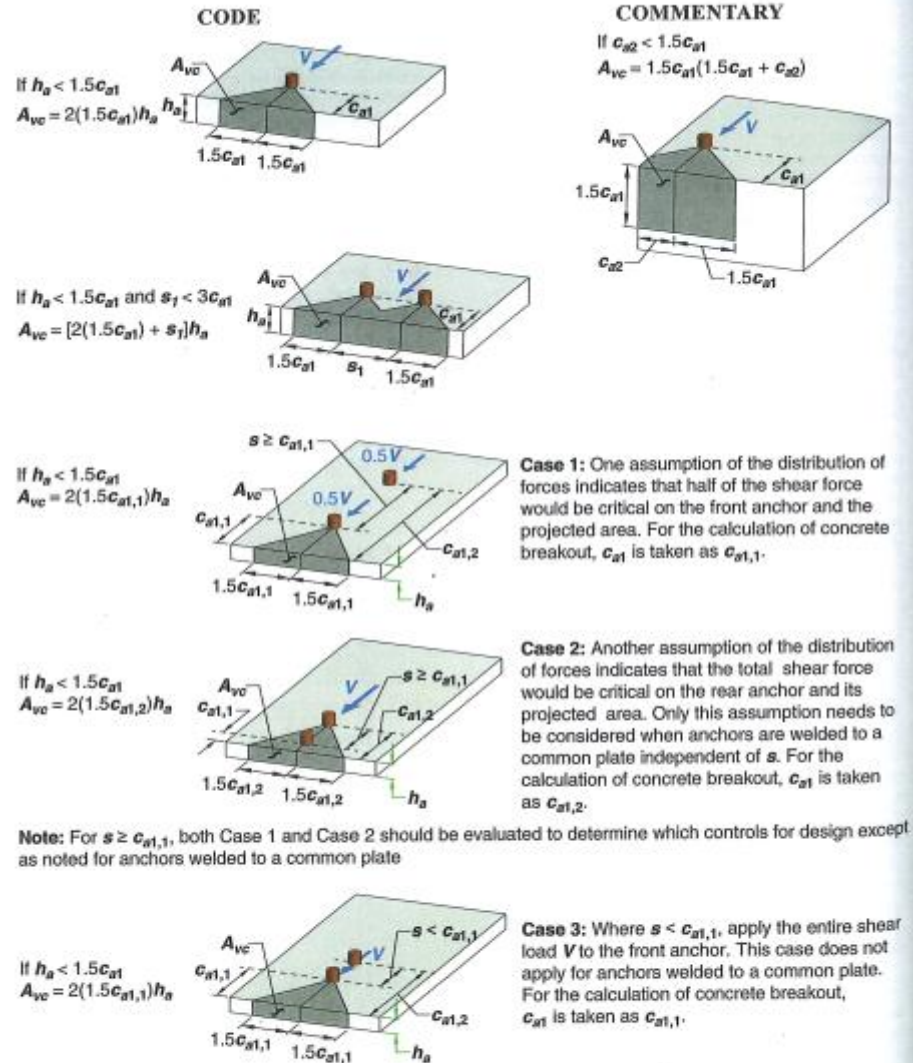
Calculation of A_{vc} for single anchors and anchor groups.
